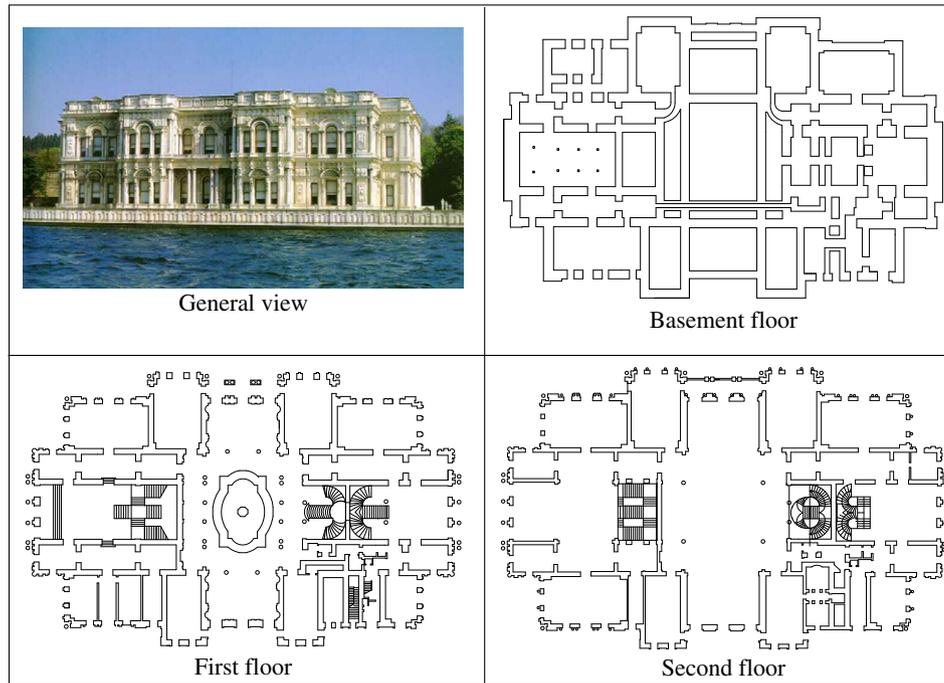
Beylerbeyi Palace and the architectural plans of its floors.
